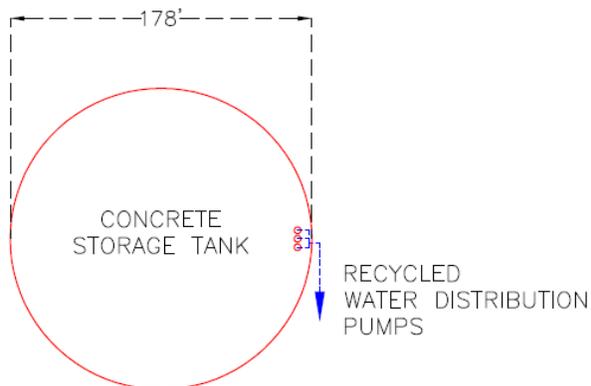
Preliminary Layout of 5 MG Prestressed Concrete Tank
